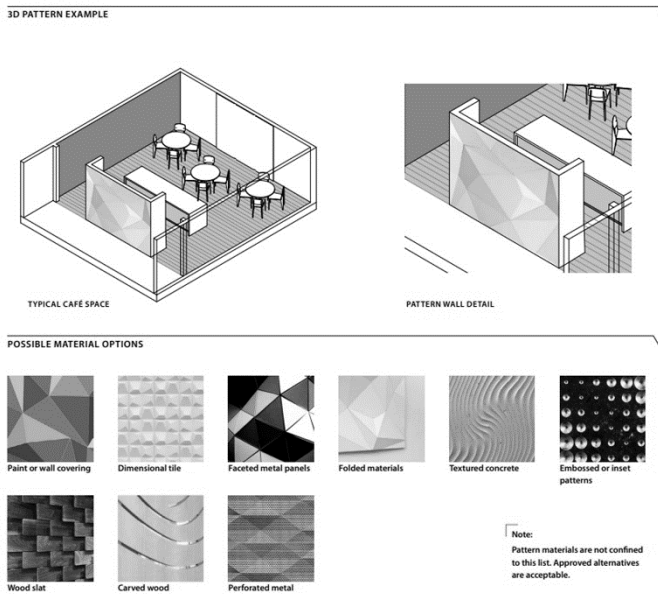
Pattern as Wallpaper or as a wall Band or as a wall panel
